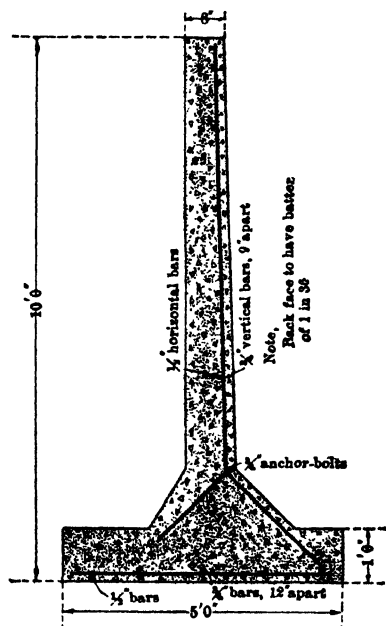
Reinforced-concrete Retaining-wall, 10 ft High
